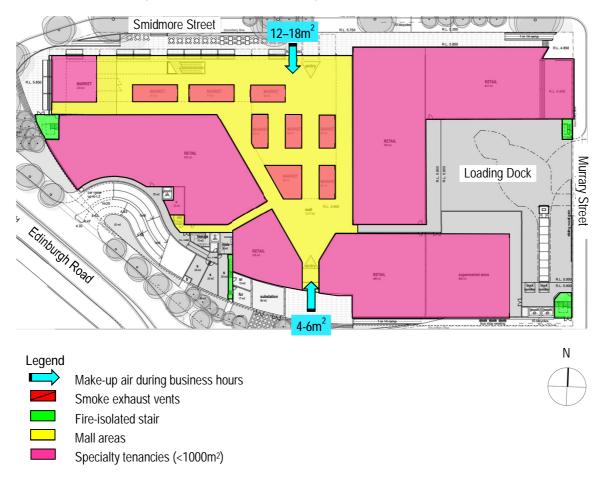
Proposed smoke exhaust and make-up air on ground floor
